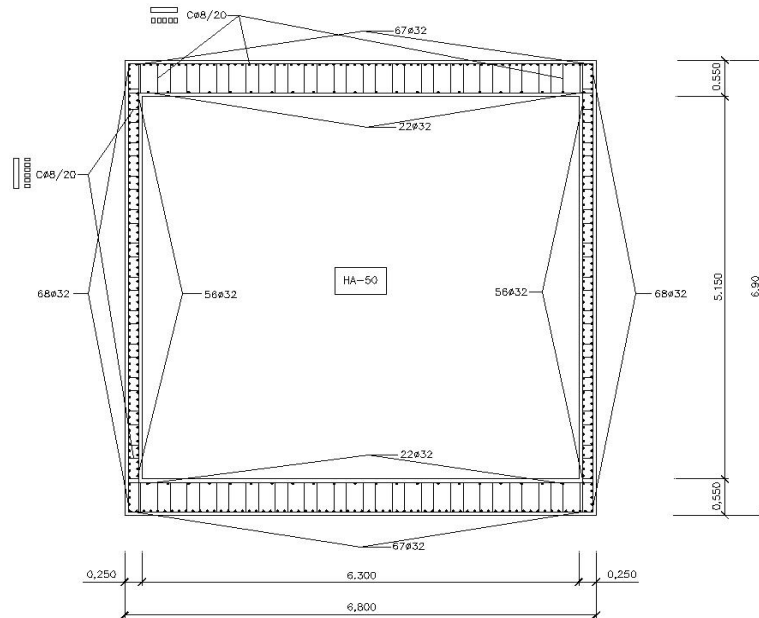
Bottom cross-section for the 60 m span viaduct and 100 m pier height
